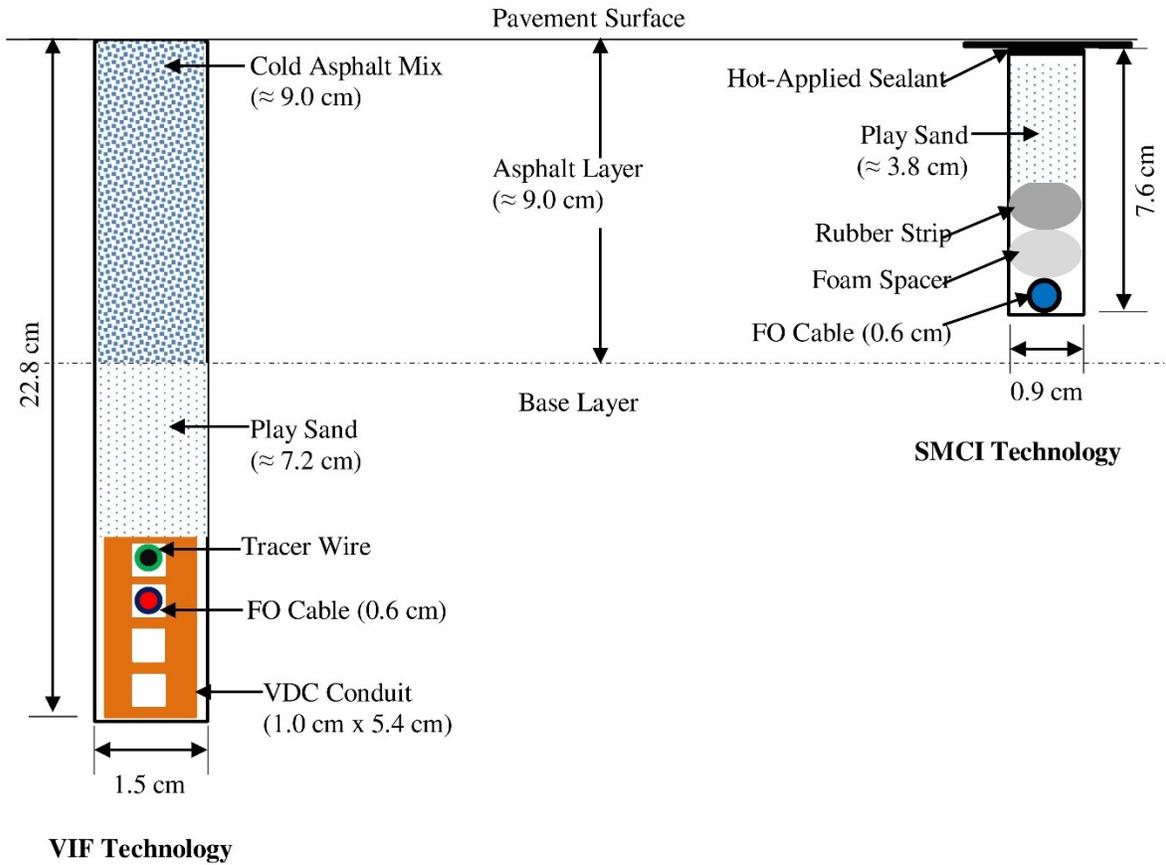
Cross-sections and backfilling details of MTT pilot installations (not to scale)
